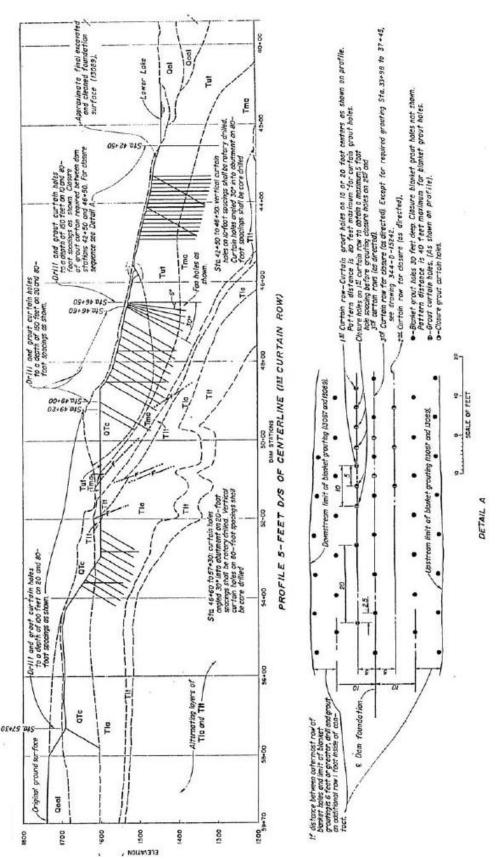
Section view of original grout curtain design at New Waddell Dam
